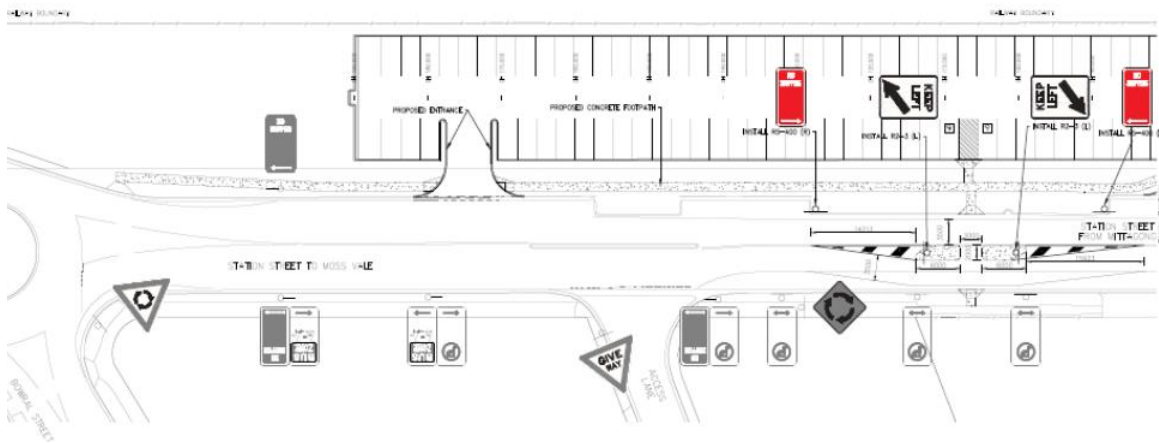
Design plans showing the approved location of the proposed pedestrian refuge.
